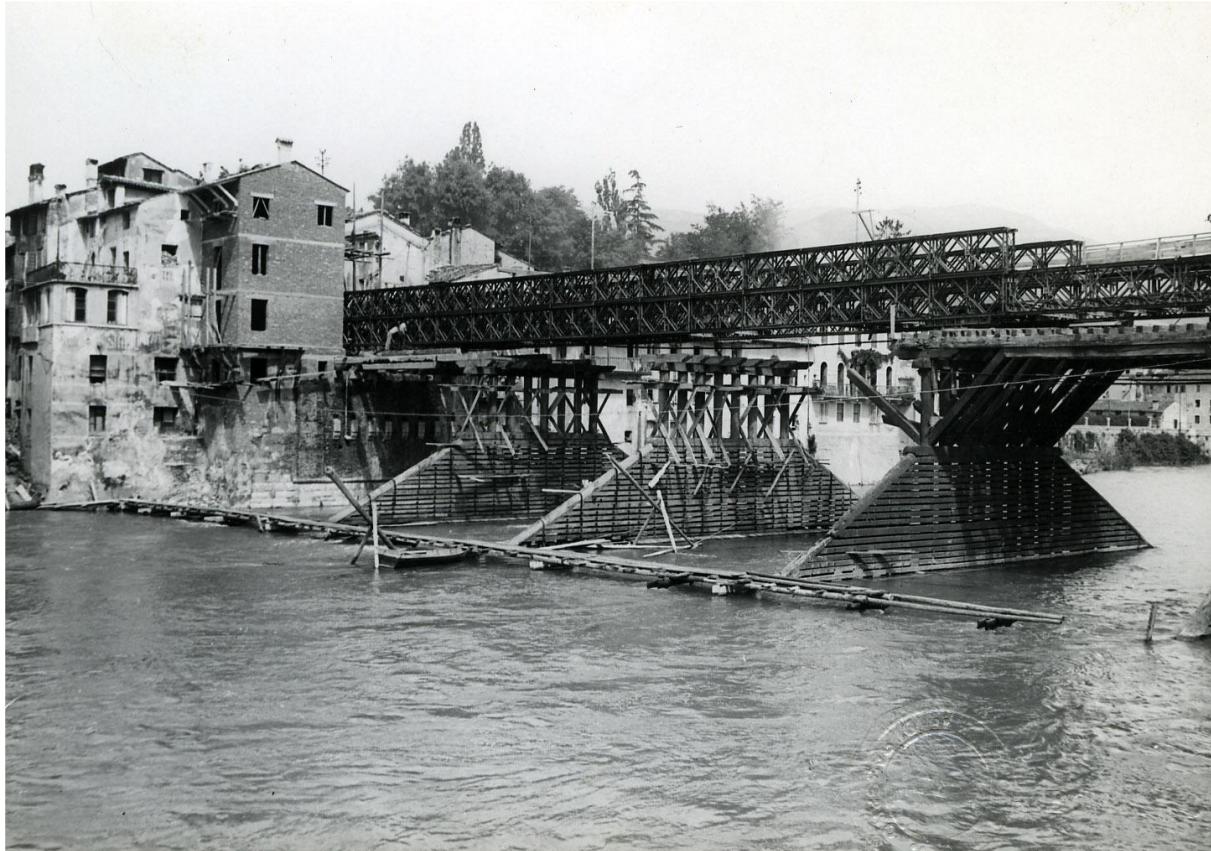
reconstruction of the Bridge, 1948 (Civic Museum of Bassano)
